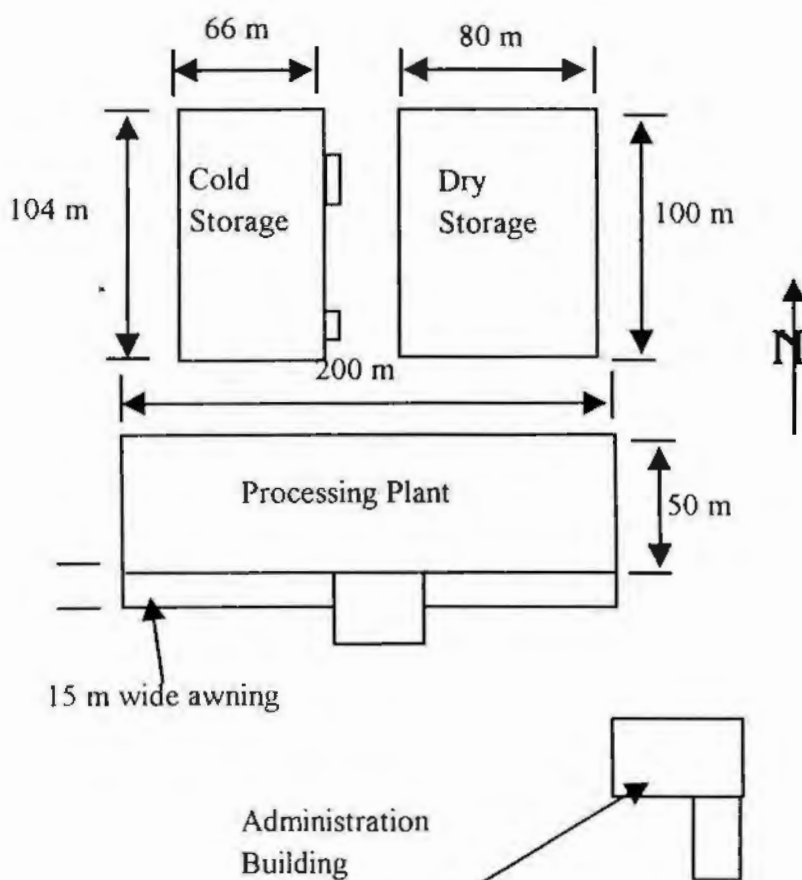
Site Plan of the Proposed Development. (Not to Scale.)
